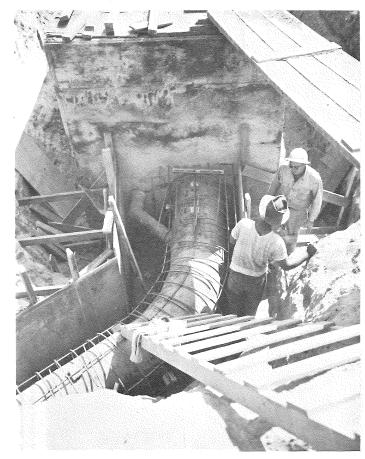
Junction of 24-inch blowoff and inspection chamber.
